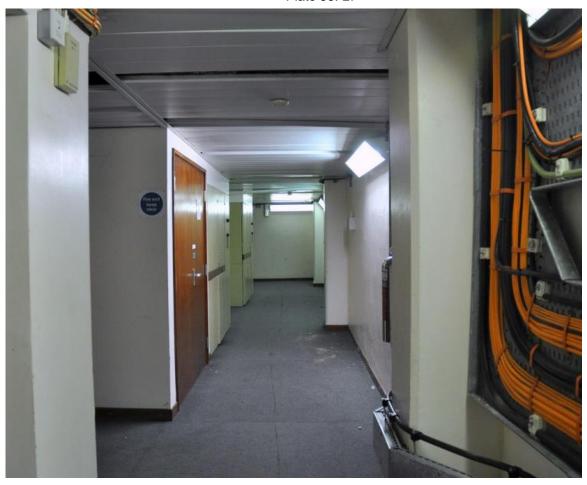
L8A corridor – note 1982 concrete pillars on right external wall
